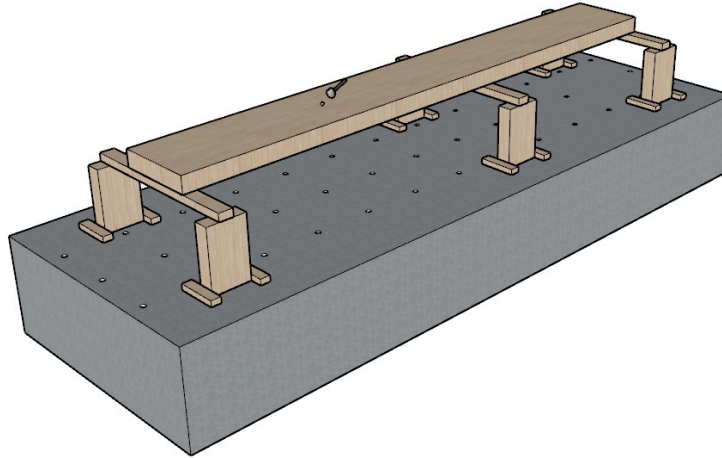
Impact hammer modal test set-up of two-span and beam-supported floor
